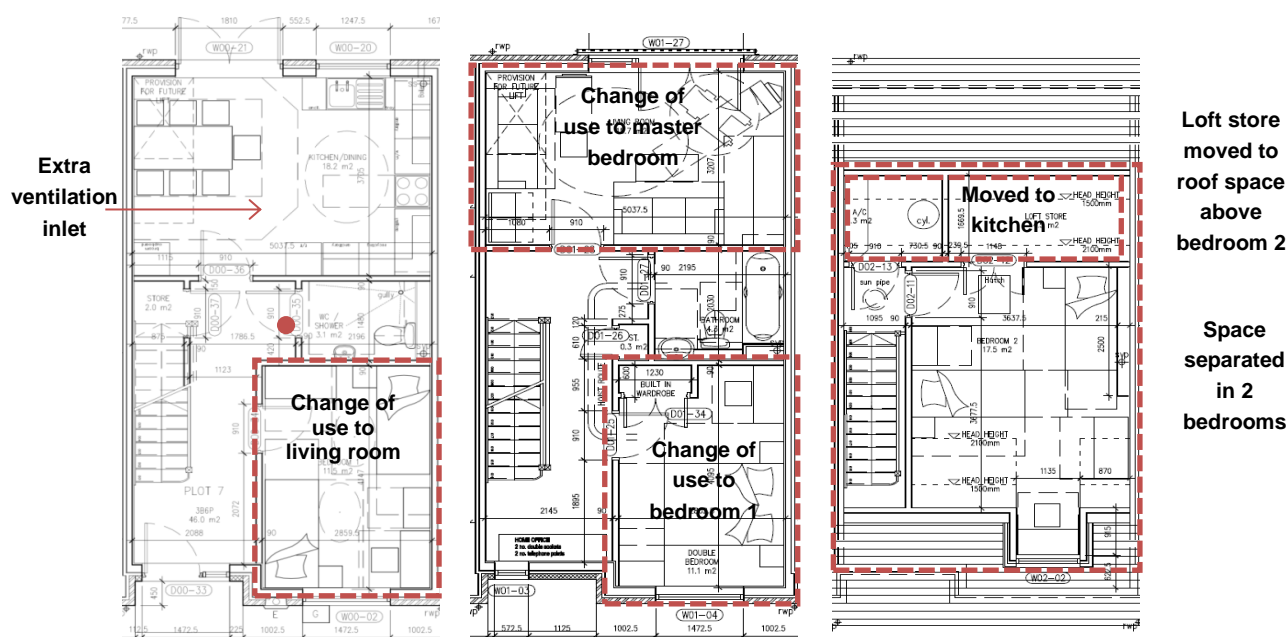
House 1 ground floor, first floor and second floor plans. Spaces where minor deviations were identified are marked in red frames.
